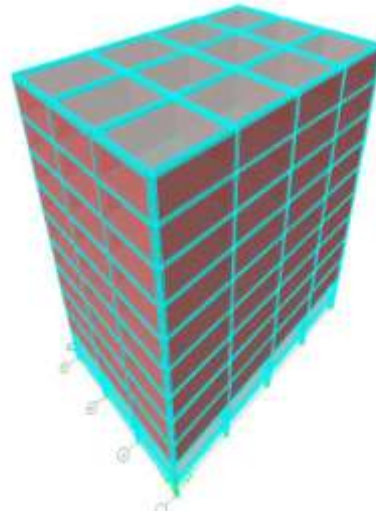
Model 5: G+10 RC two soft storey building with slab element 3D view
